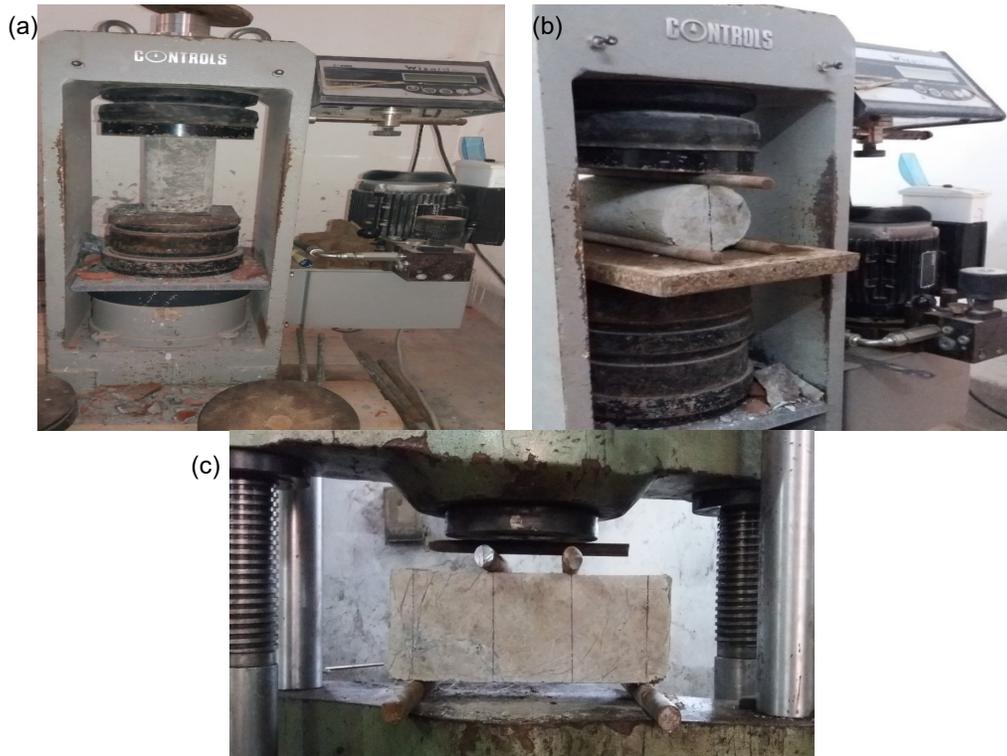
(a) Compressive Strength Test for Cylindrical Concrete Specimens, (b) Splitting Tensile Strength Test for Cylindrical Concrete Specimens, (c) Flexural Strength Test for Prism Block Specimens
